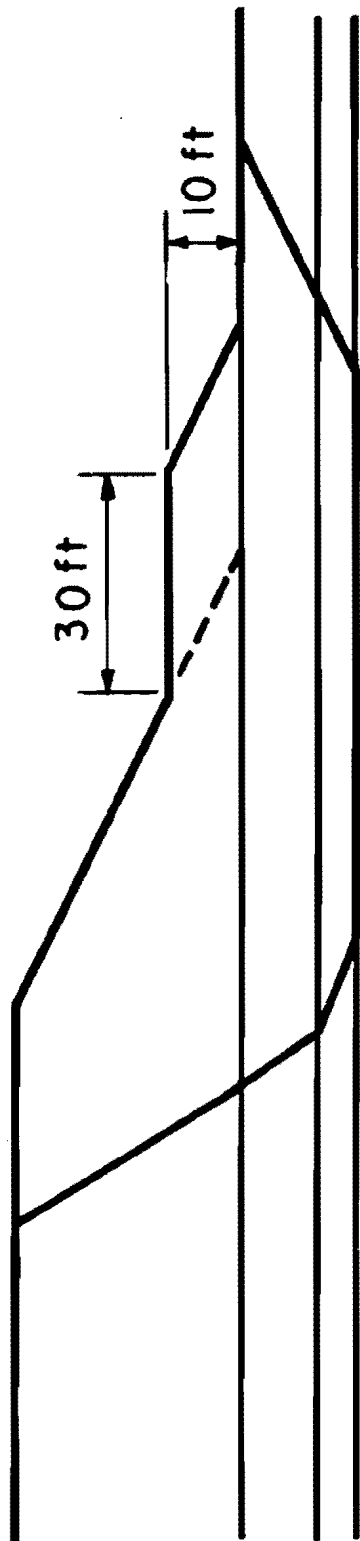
Cross-Section of Slope for Example Problem E after Slope has been Benched.
